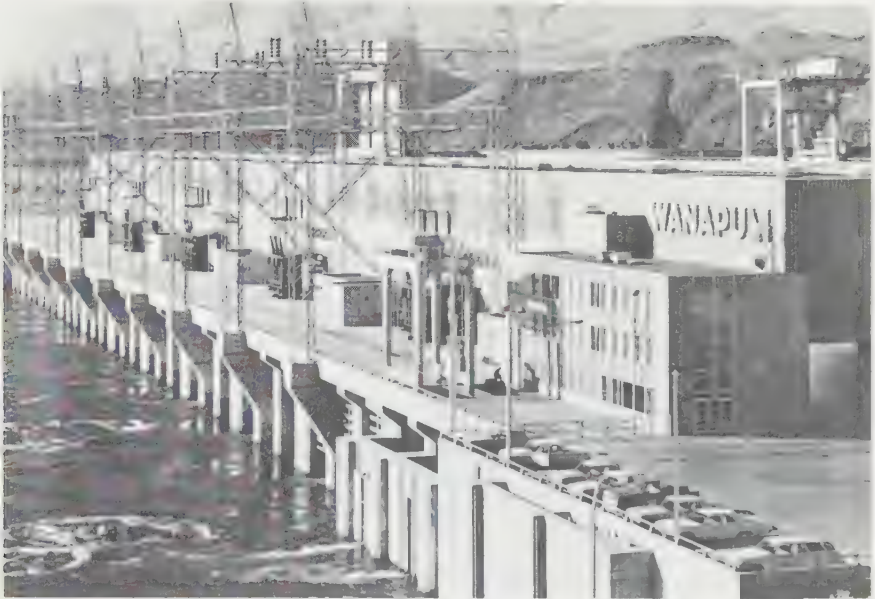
Wanapum powerhouse (1963), 830-mw development on Columbia River, Washington.
